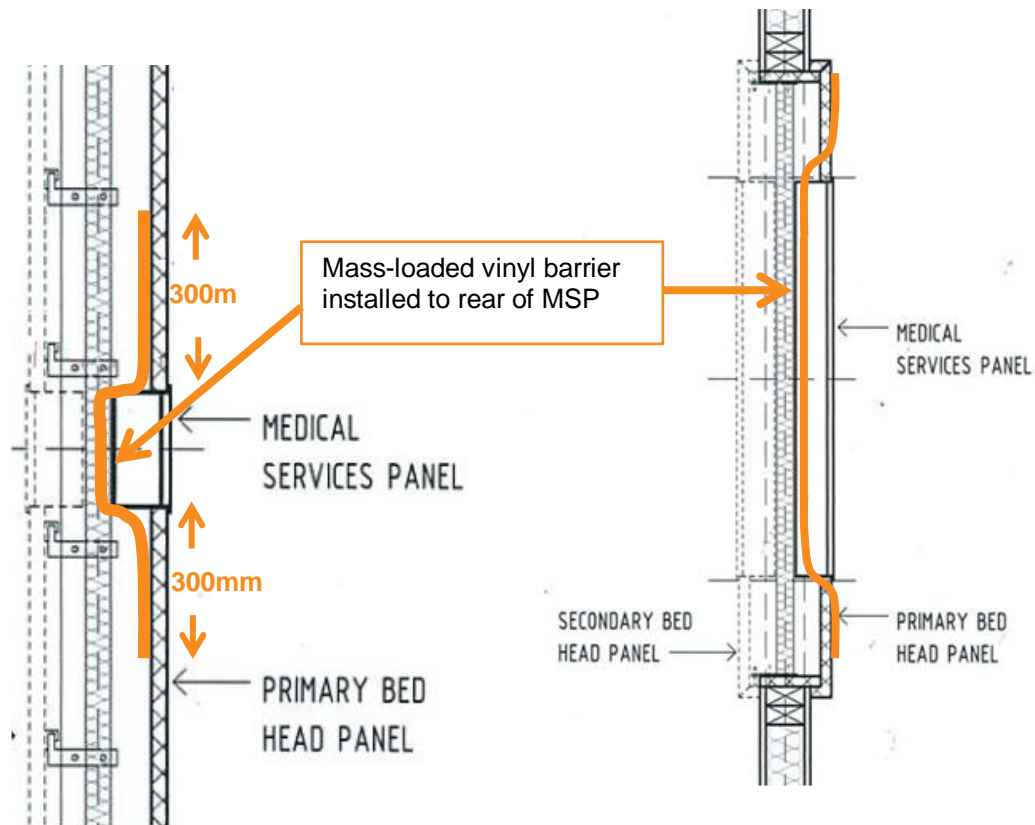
Mass-Loaded Barrier to MSP (Left Image – Section; Right Image – Plan)
